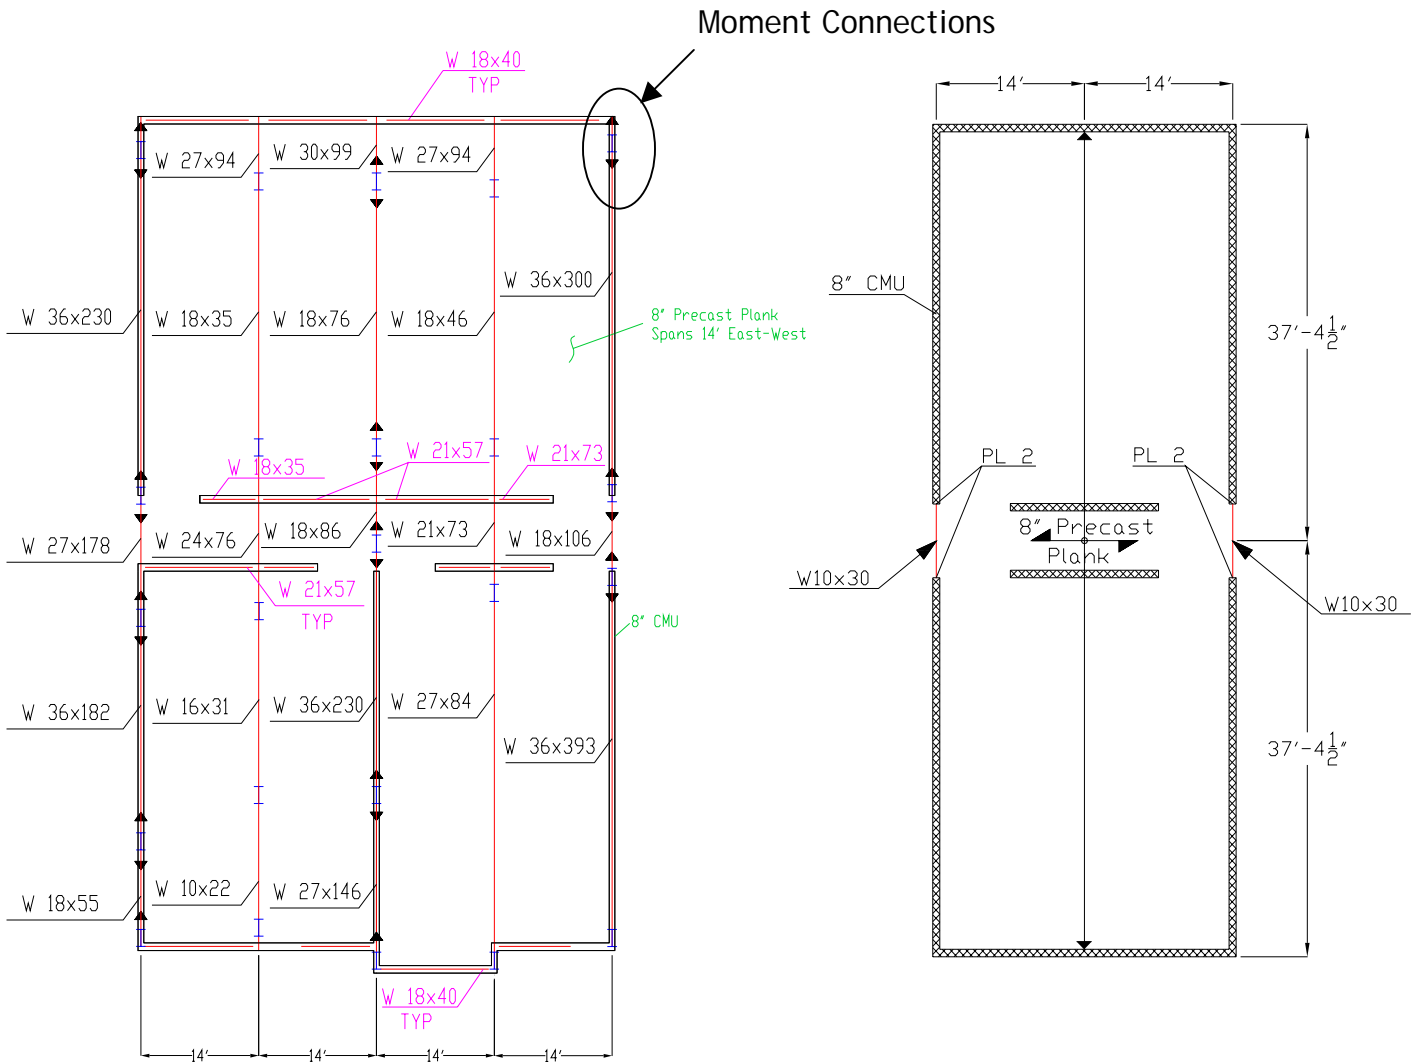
Typical Bays - 2<sup>nd</sup> Floor
